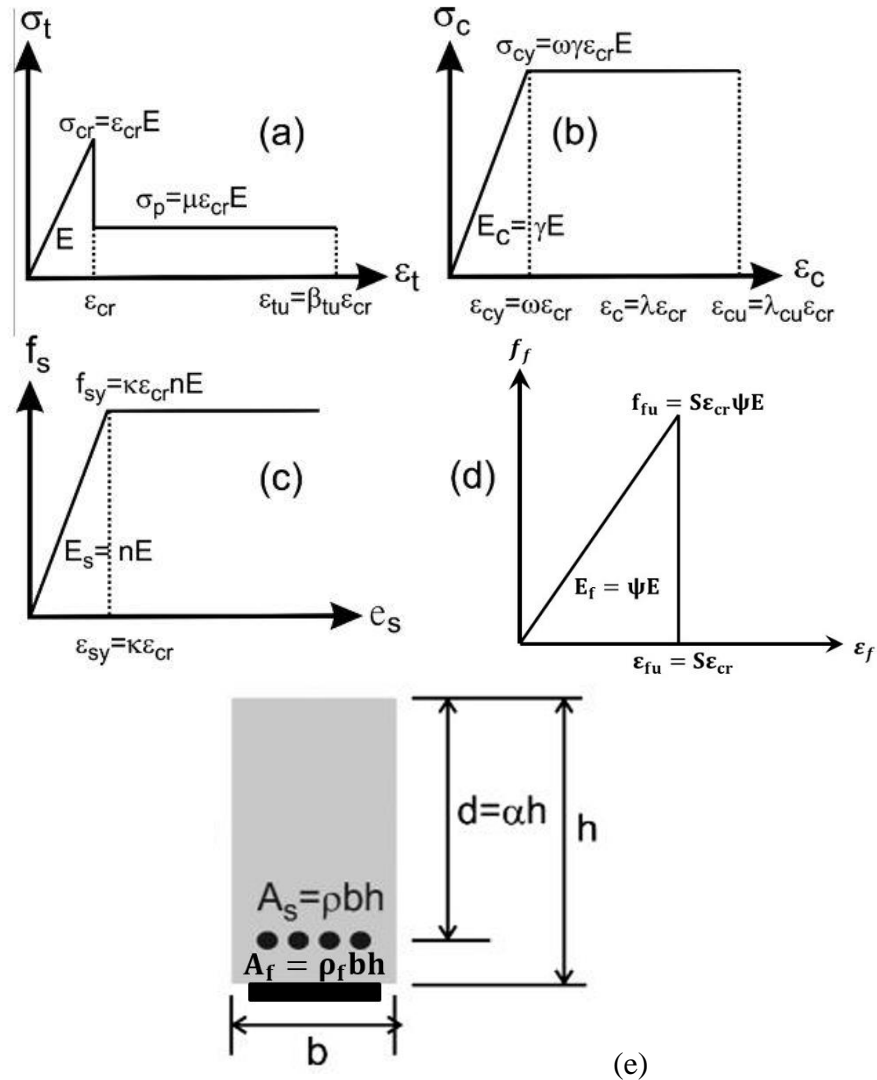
Material model for single reinforced concrete design (a) tension model; (b) compression model; (c) steel model; (d) FRP model; (e) Beam cross section.
